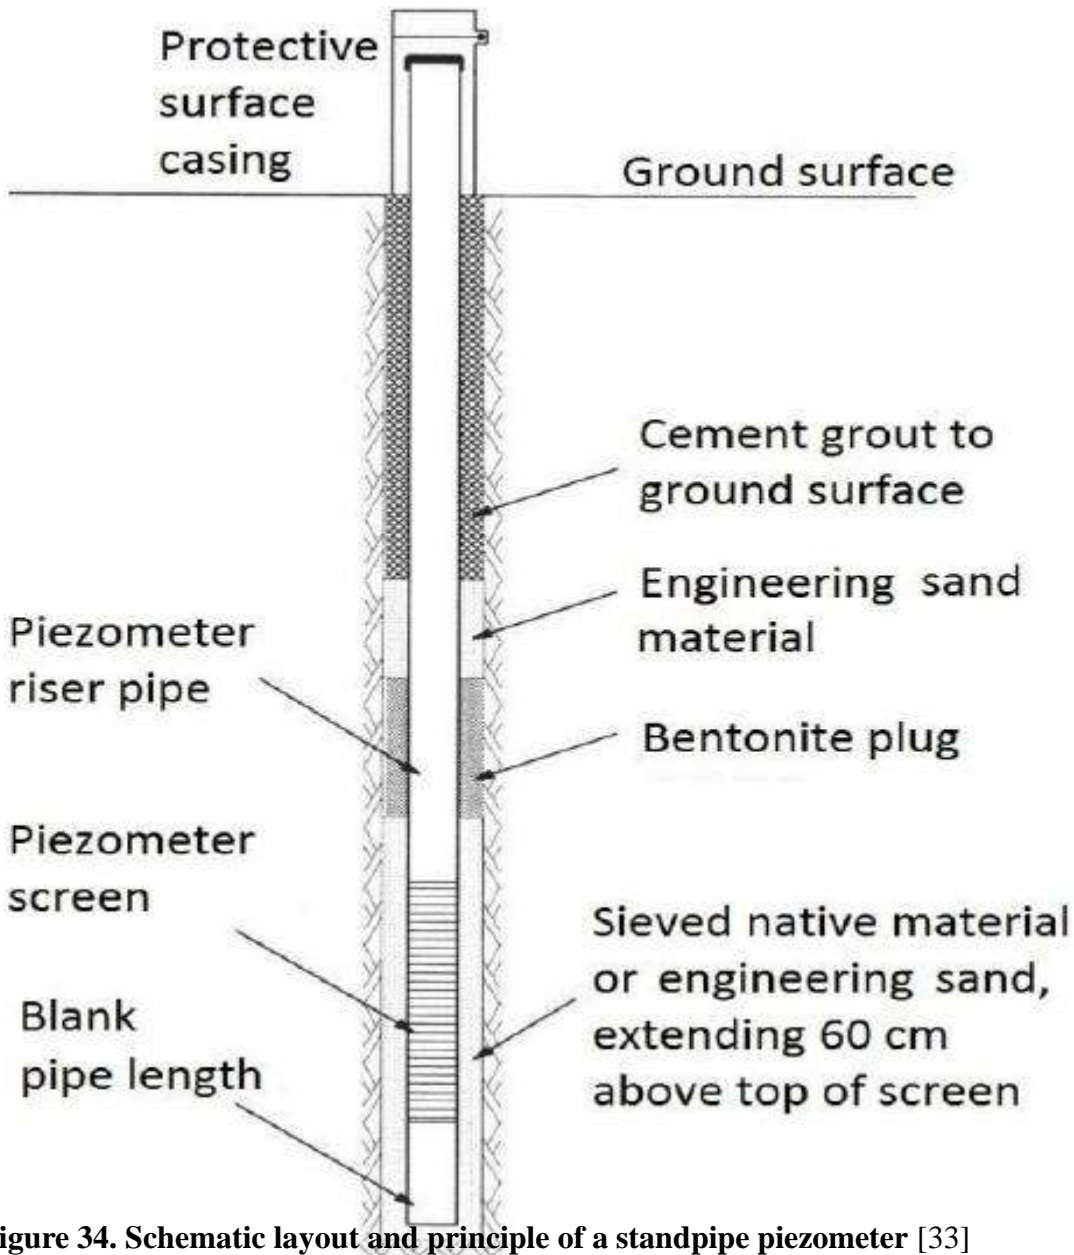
Schematic layout and principle of a standpipe piezometer [33]
